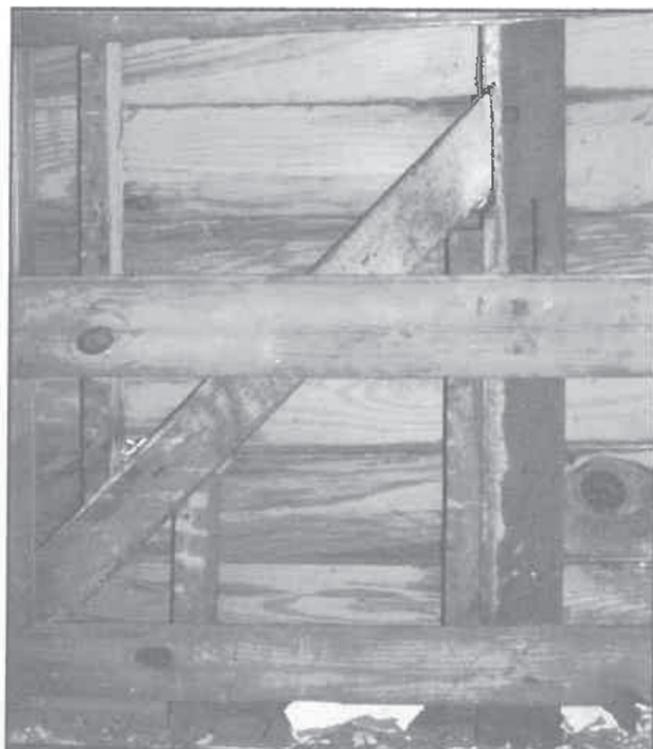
Phase I wall framing showing corner brace and mortice for original north wall.
